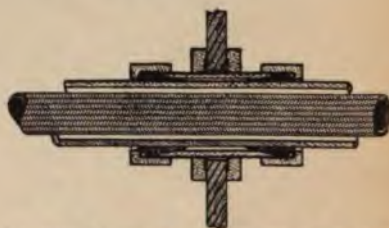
Cross-section of conduit tube through a bulkhead.
